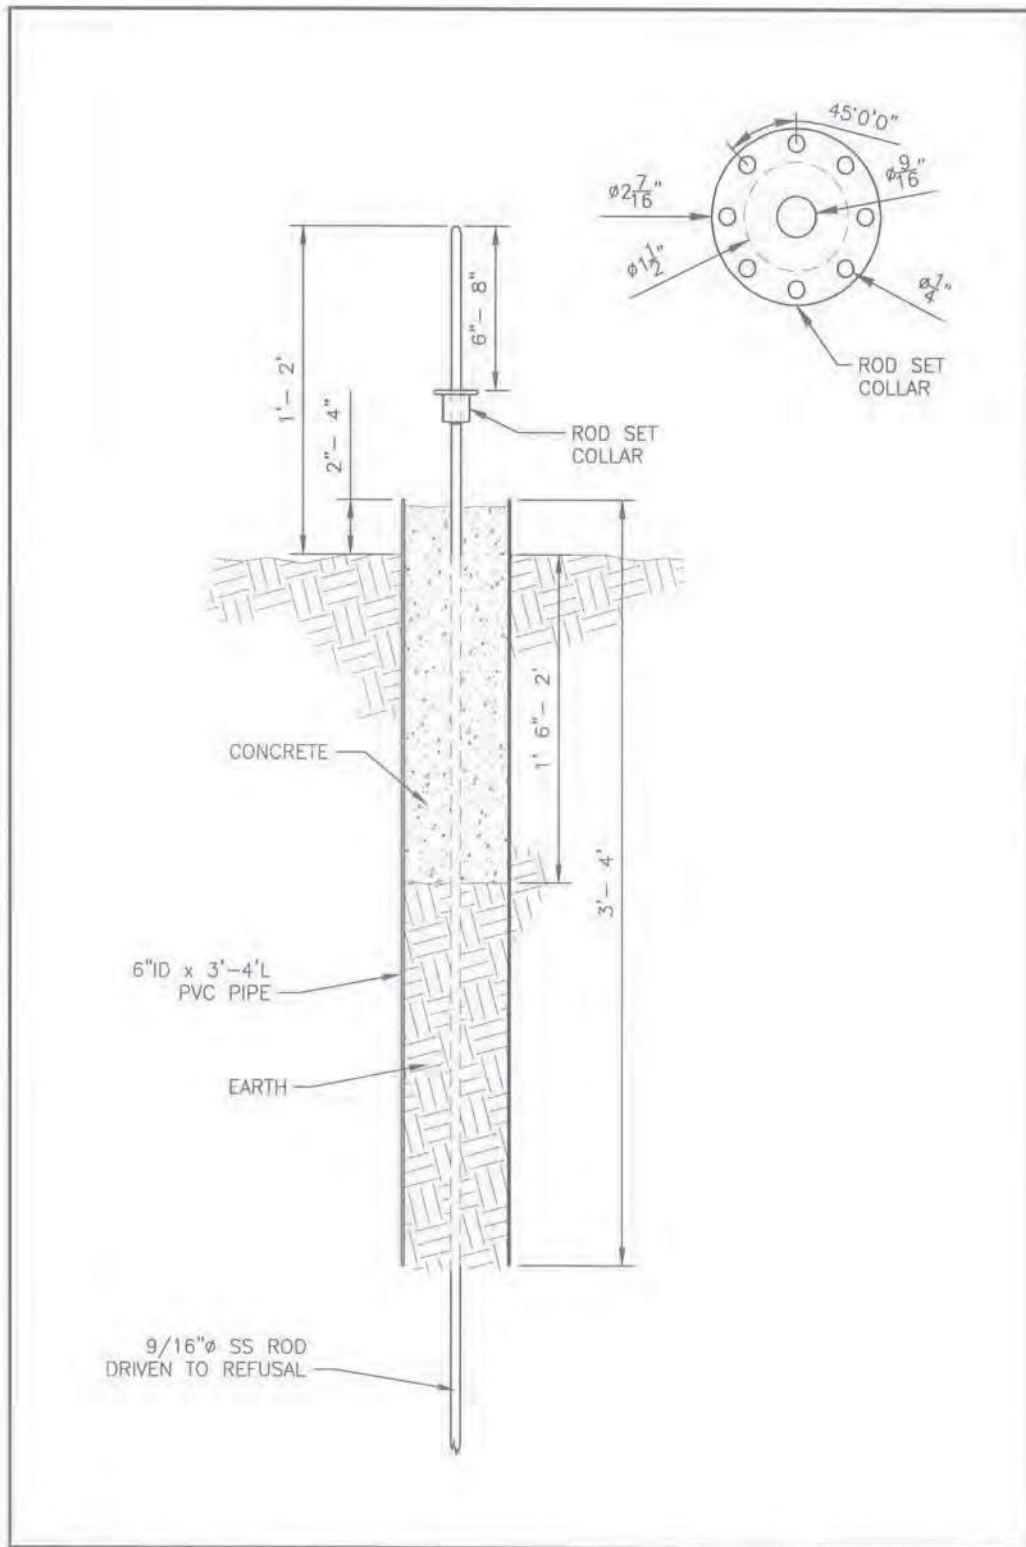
Detailed construction drawing of a typical RSET station with collar. Inset: Collar detail.
